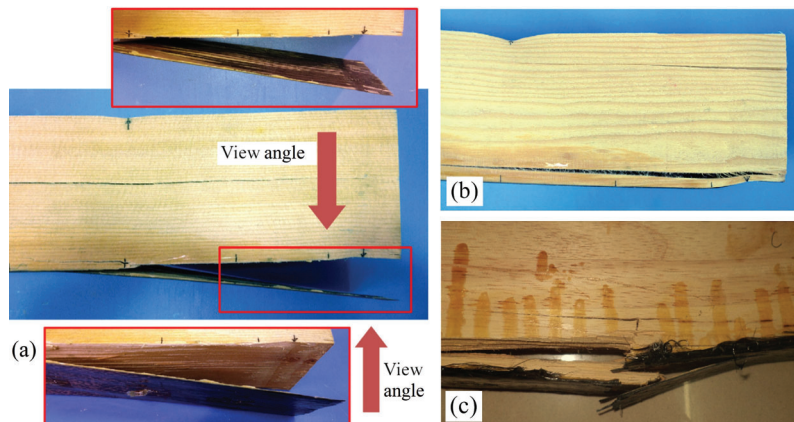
Failure modes of Type 3 tests: (a) ripping failure at epoxy-wood interface; (b) wood cracking [57]; (c) FRP composite sheet rupture [60]
